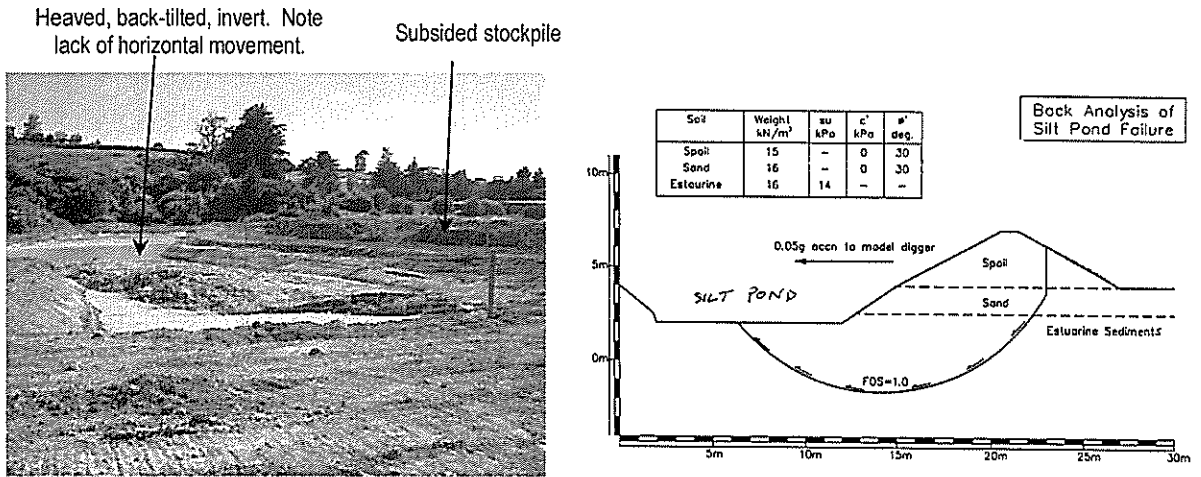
Silt Pond Failure, Valley of Te Auetu
